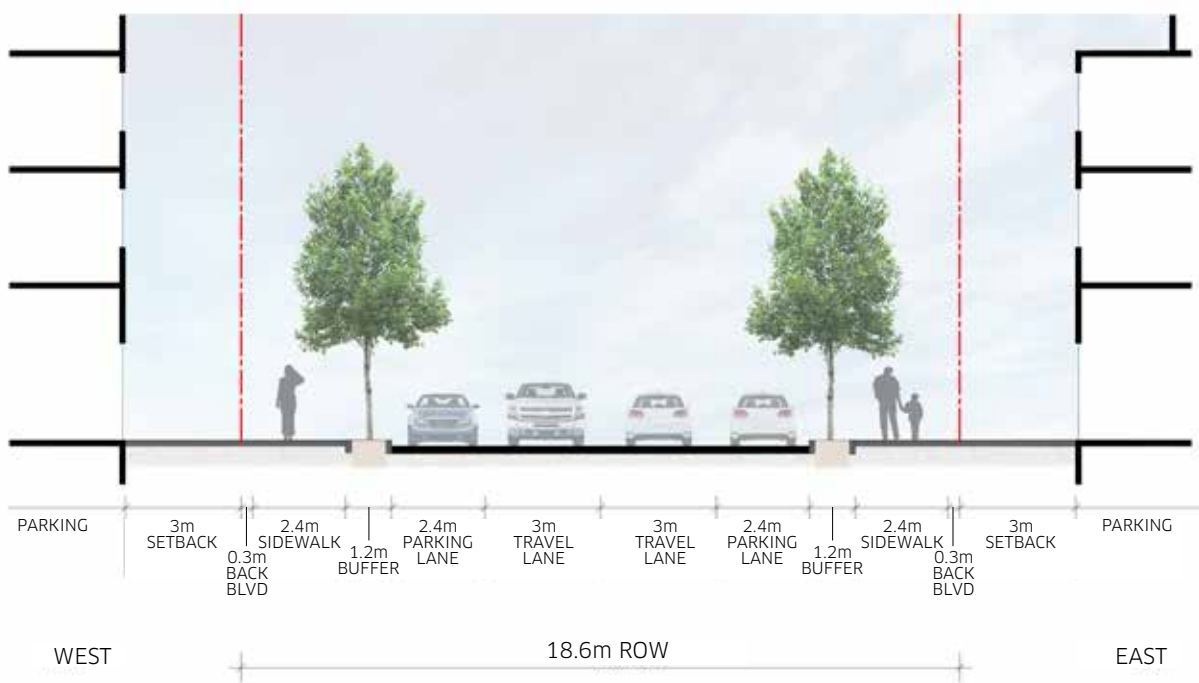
New Commercial Street (Extension of McGuigan Avenue)
